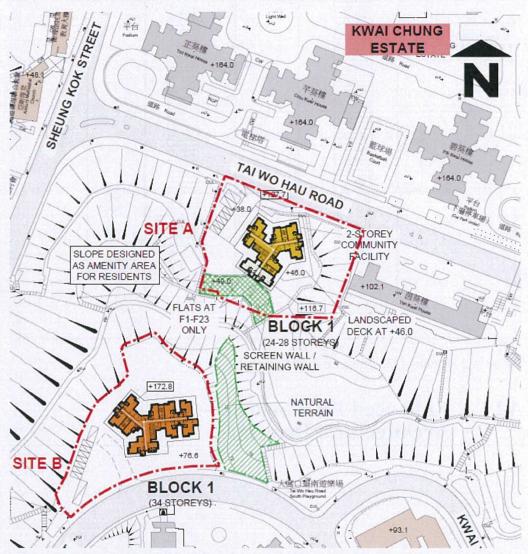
Master Layout Plan of the Proposed PRH Scheme
